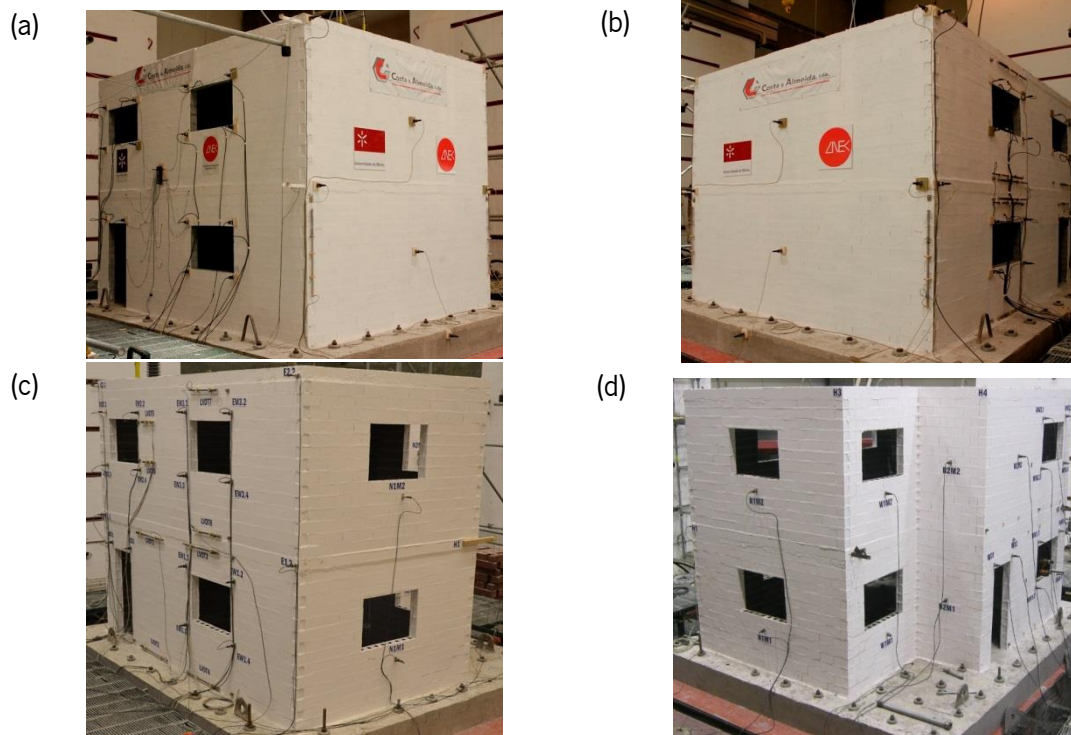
Masonry buildings for the experimental campaign: (a, b) symmetric and (c, d) asymmetric
